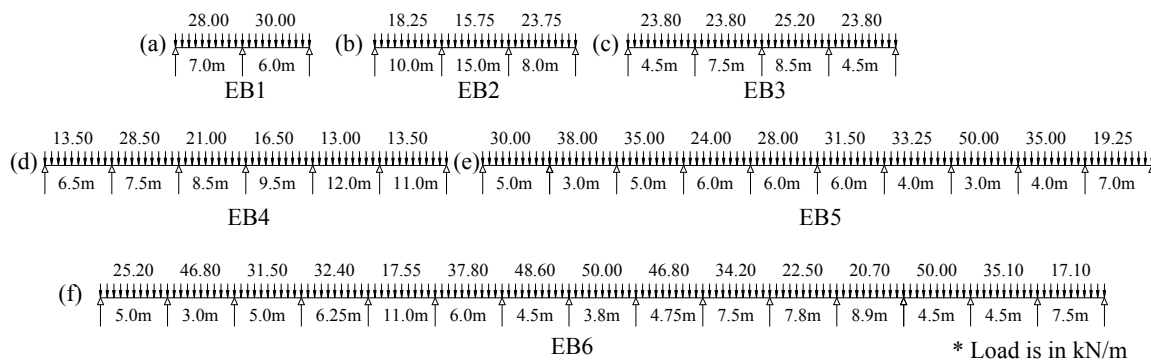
Example beams (a) two span beam (EB1), (b) three span beam (EB2), (c) four span beam (EB3), (d) six span beam (EB4), (e) ten span beam (EB5) and (f) fifteen span beam (EB6)
